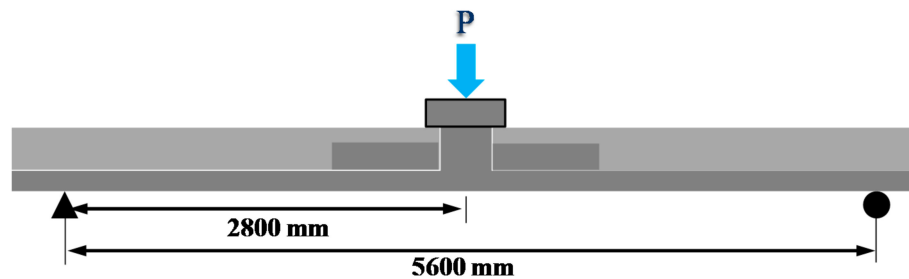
shows the loading plans of each specimen. The flexural specimens, UF and CF specimens, were simply supported and were subjected to two-point loading with a shear span length of 2750 mm, as shown in Figure 7a. The shear specimens, US and CS specimens, were also simply supported, however they were subjected to one-point loading with a shear span length of 1200 mm, as shown in Figure 7b. After the shear test was performed at one end, the same shear test was carried out at the other end. As a result, two shear test result sets were obtained from the US and CS specimens, respectively. The continuous composite slab specimens that resist the negative moment, NFW and NFE specimens, were placed upside down, as shown in Figure 7c,d, and were simply supported with a one-point load. The NFW specimen with a span length of 5.6 m was intended to fail in flexure at the section where the 5-D19 tensile rebars are cut; that is, 1.5 m away from the loading point. On the other hand, the NFE specimen was planned to have a span length of 2.8 m in order to investigate the maximum negative moment resistance performance near the stub-slab interface. All of the specimens were loaded under displacement control with a 1000 kN capacity actuator.
